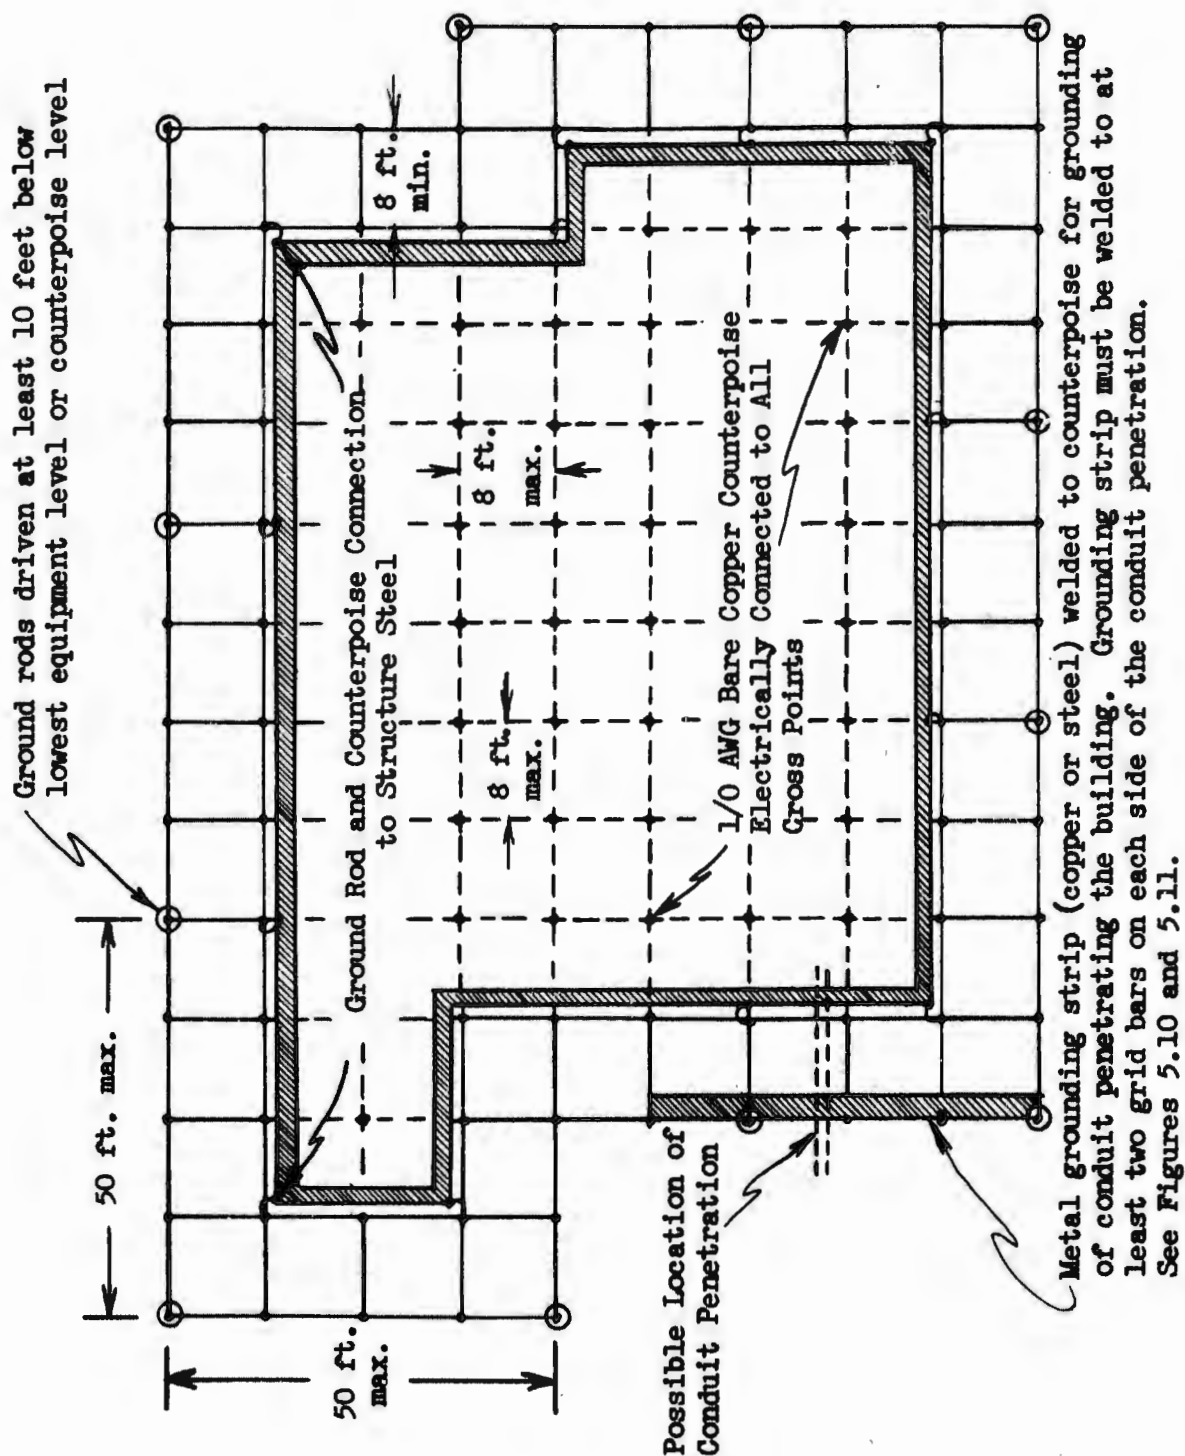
Ground Rods and Counterpoise Layout (typical)
